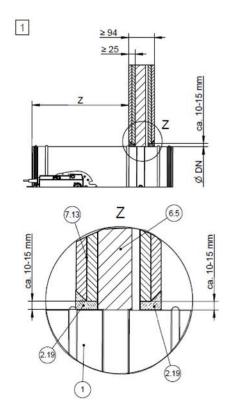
Dry mortarless installation into a lightweight partition wall, without installation kit
